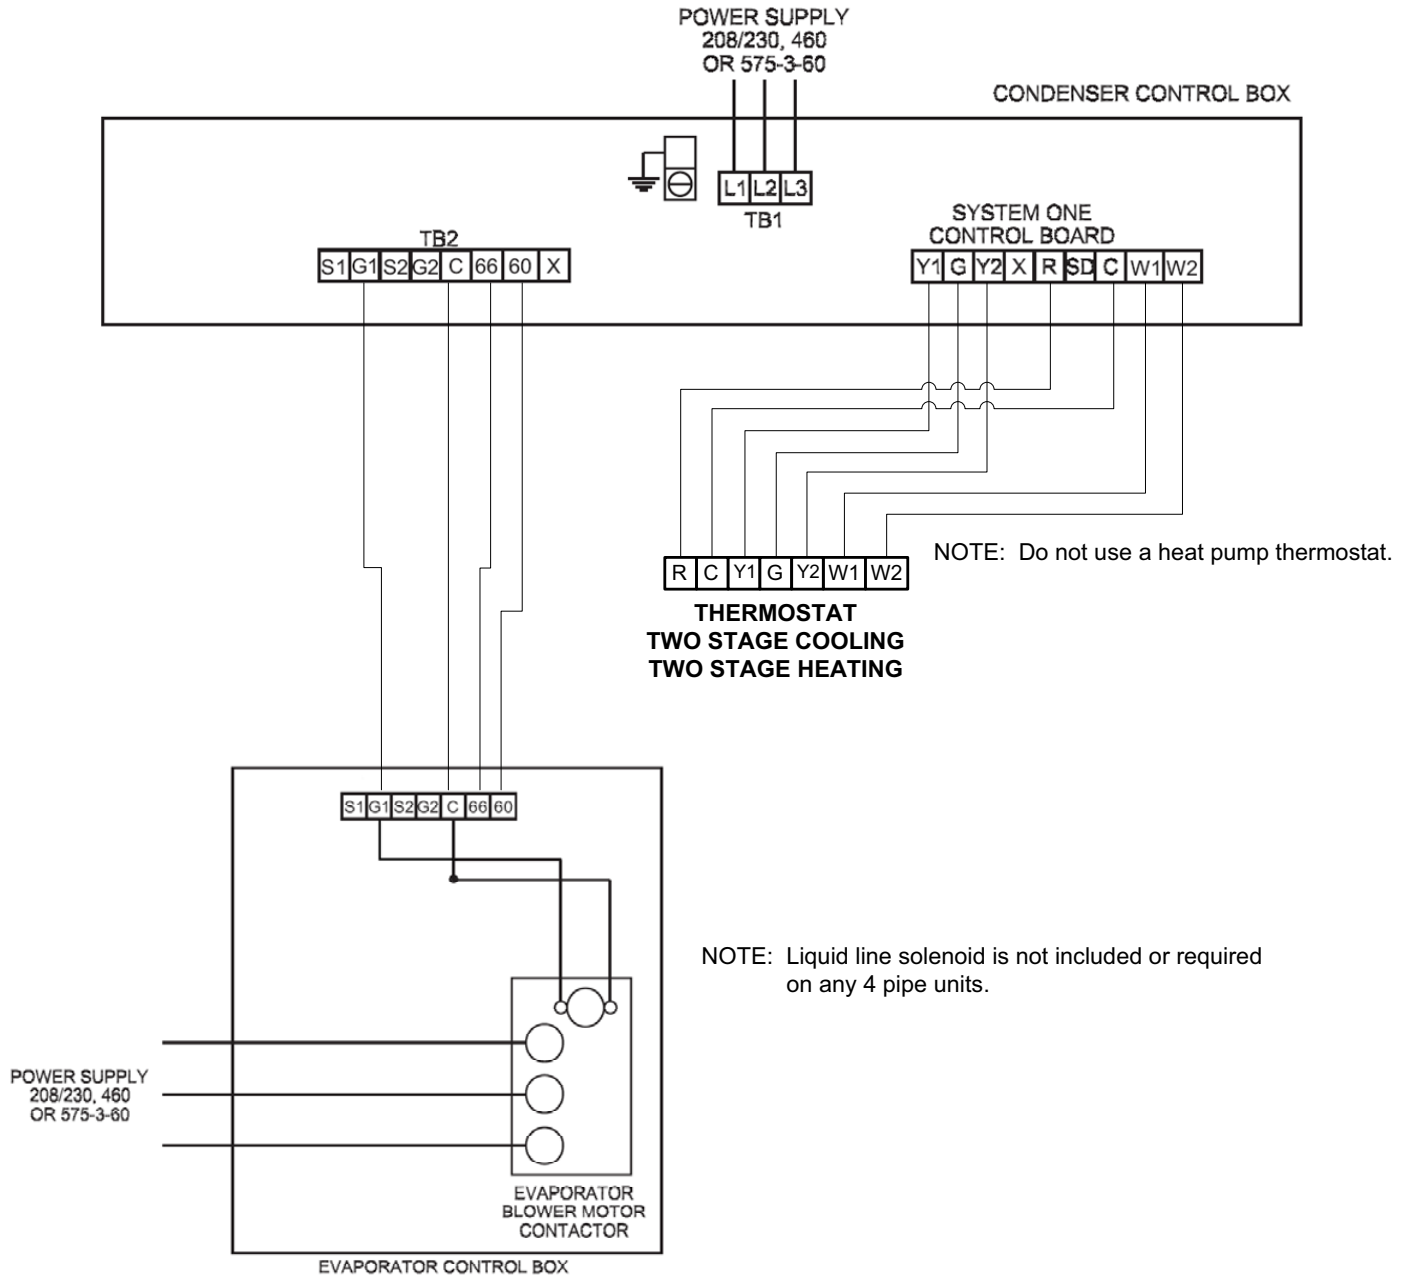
Typical Field Wiring Diagram - NJ-15 thru -20 Evaporator Unit with PJ-15 thru -20 Heat Pump
